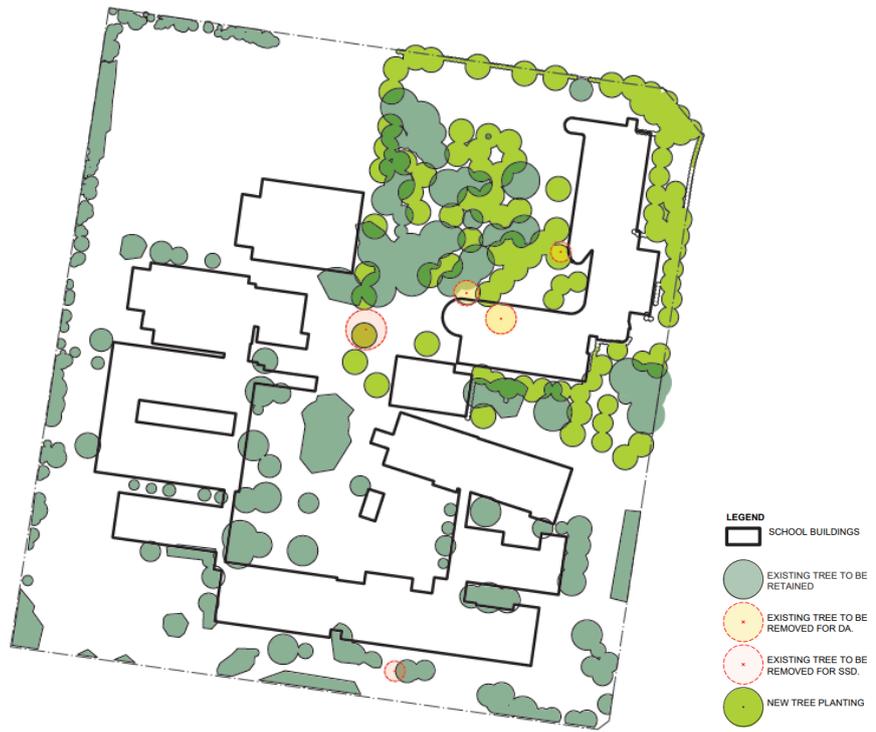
Landscape Plan of the proposed development illustrating supplementary proposed planting
